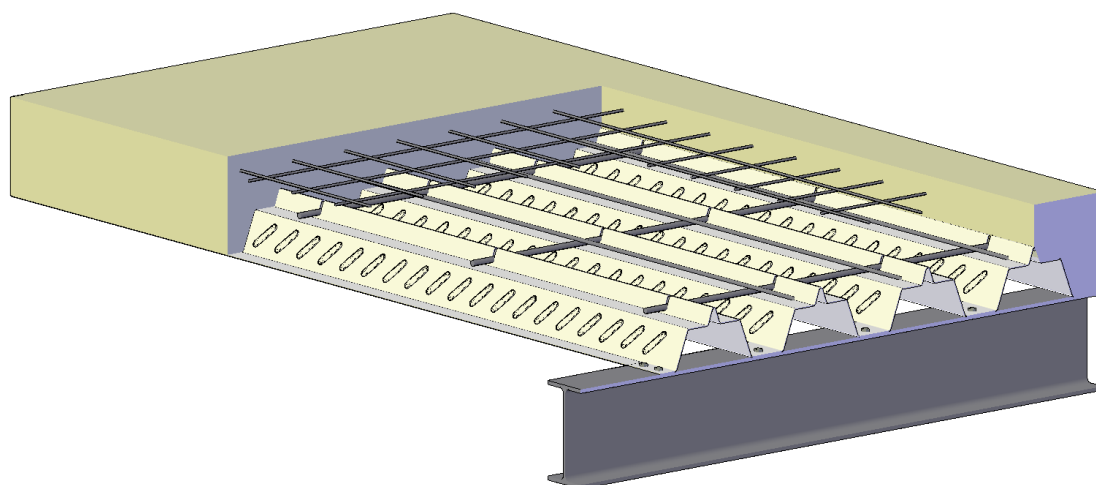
Steel-concrete composite slabs with transversal reinforcement
